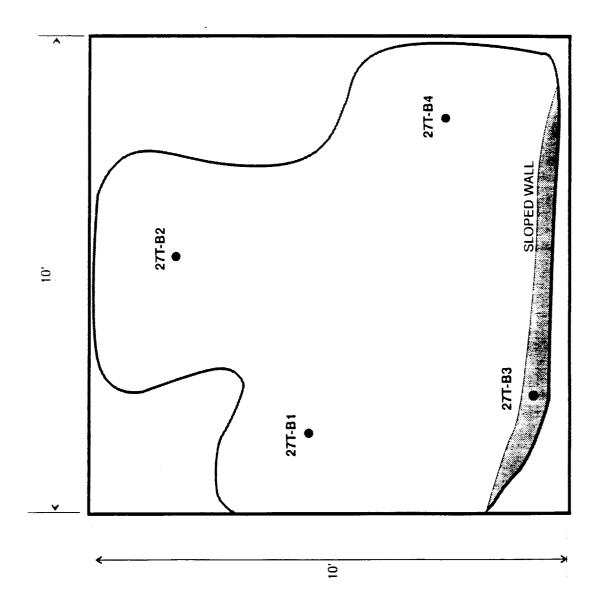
SOIL BORING LOCATIONS FOR PIT NO. 27T
